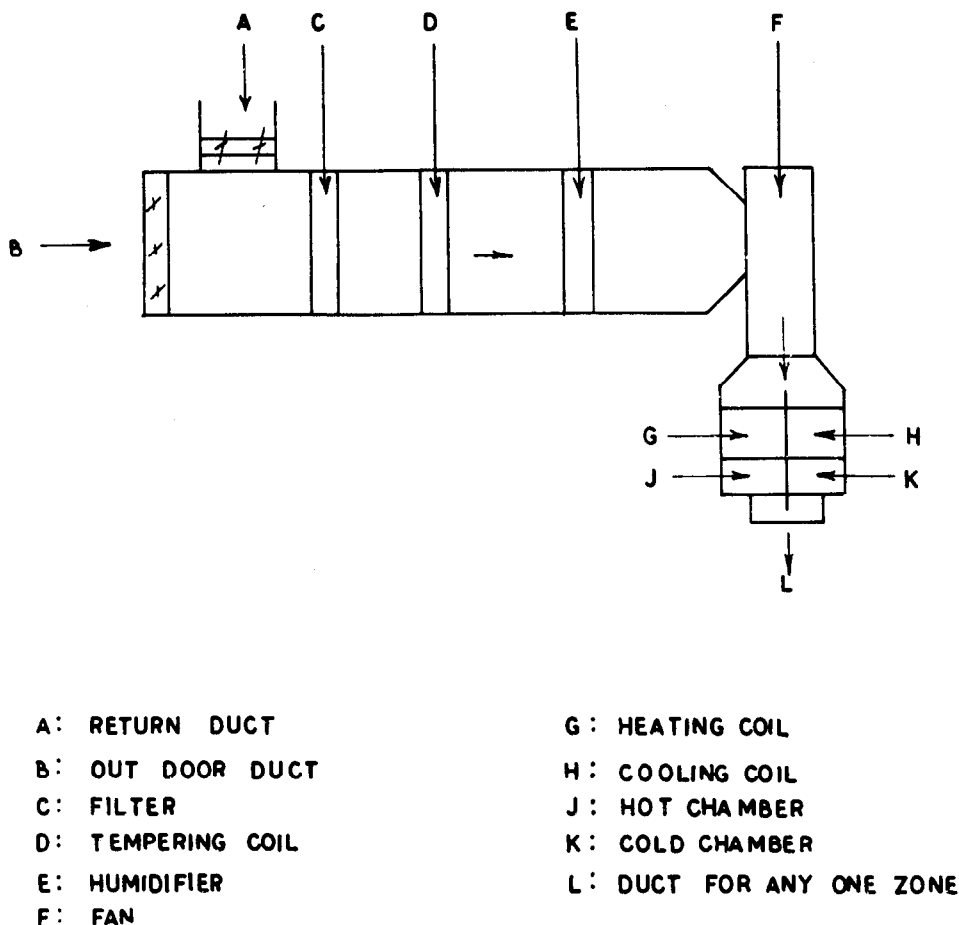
BLOCK DIAGRAM OF A CENTRAL SYSTEM OF A TYPICAL BUILDING
